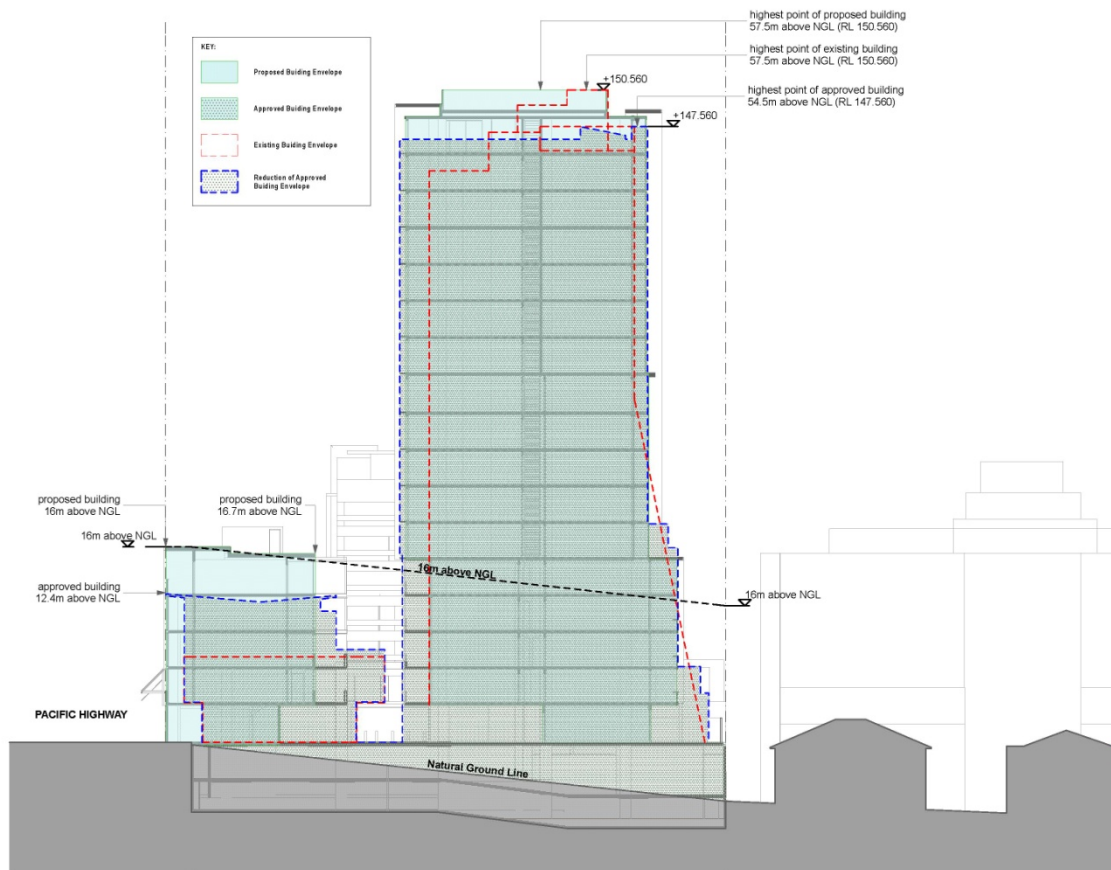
Figure A - Building 1 & 3 height compliance plan (existing, approved/commenced and proposed) (Source JPRA)
